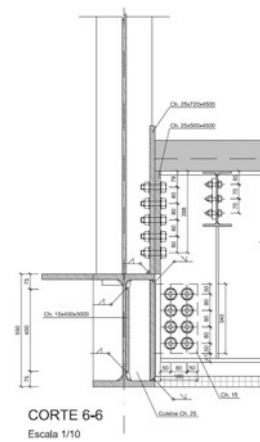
Detail of the connection between the slab and the steel structure, cross section
